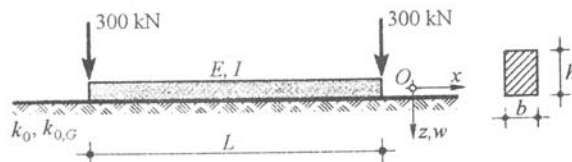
Loading condition for the beam resting on elastic foundation.
